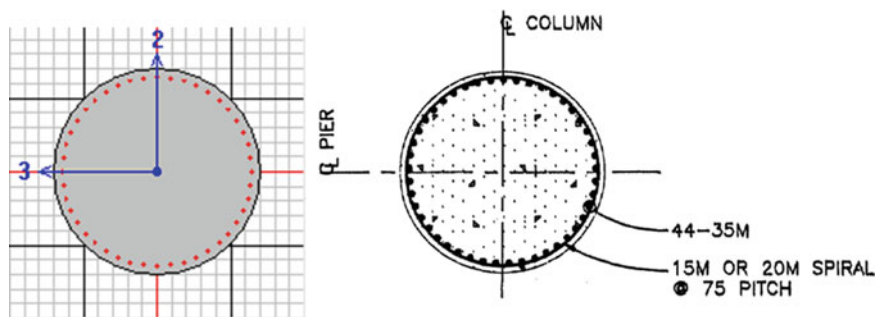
Column section detail in FEM (left) and drawing (right)
